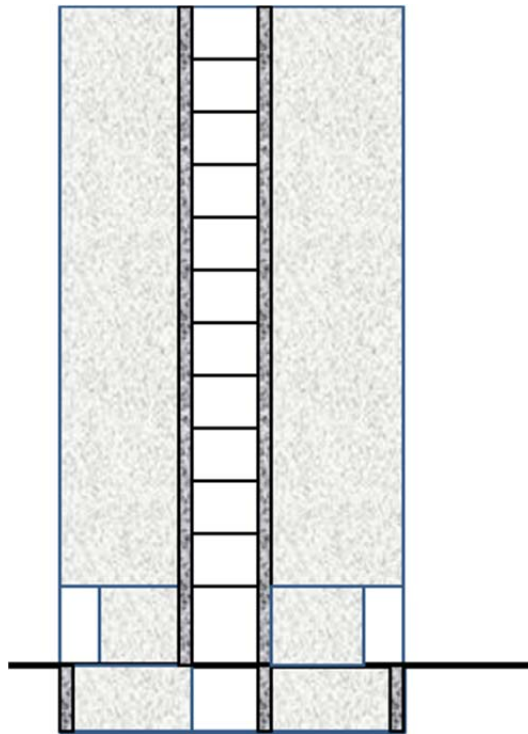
Typical cross-section of mid-rise residential building in Chile.
